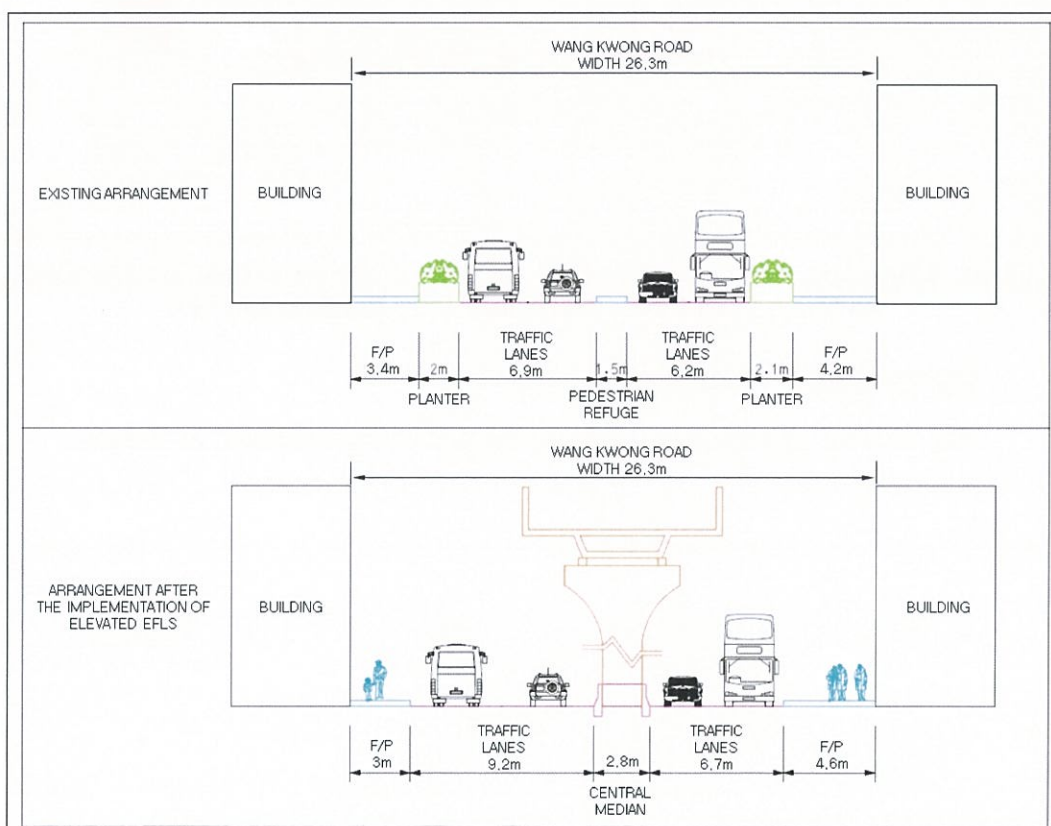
Typical Cross Section Plan of Option 3 (Elevated Dedicated System) on Wang Kwong Road (Before and After Implementation)
